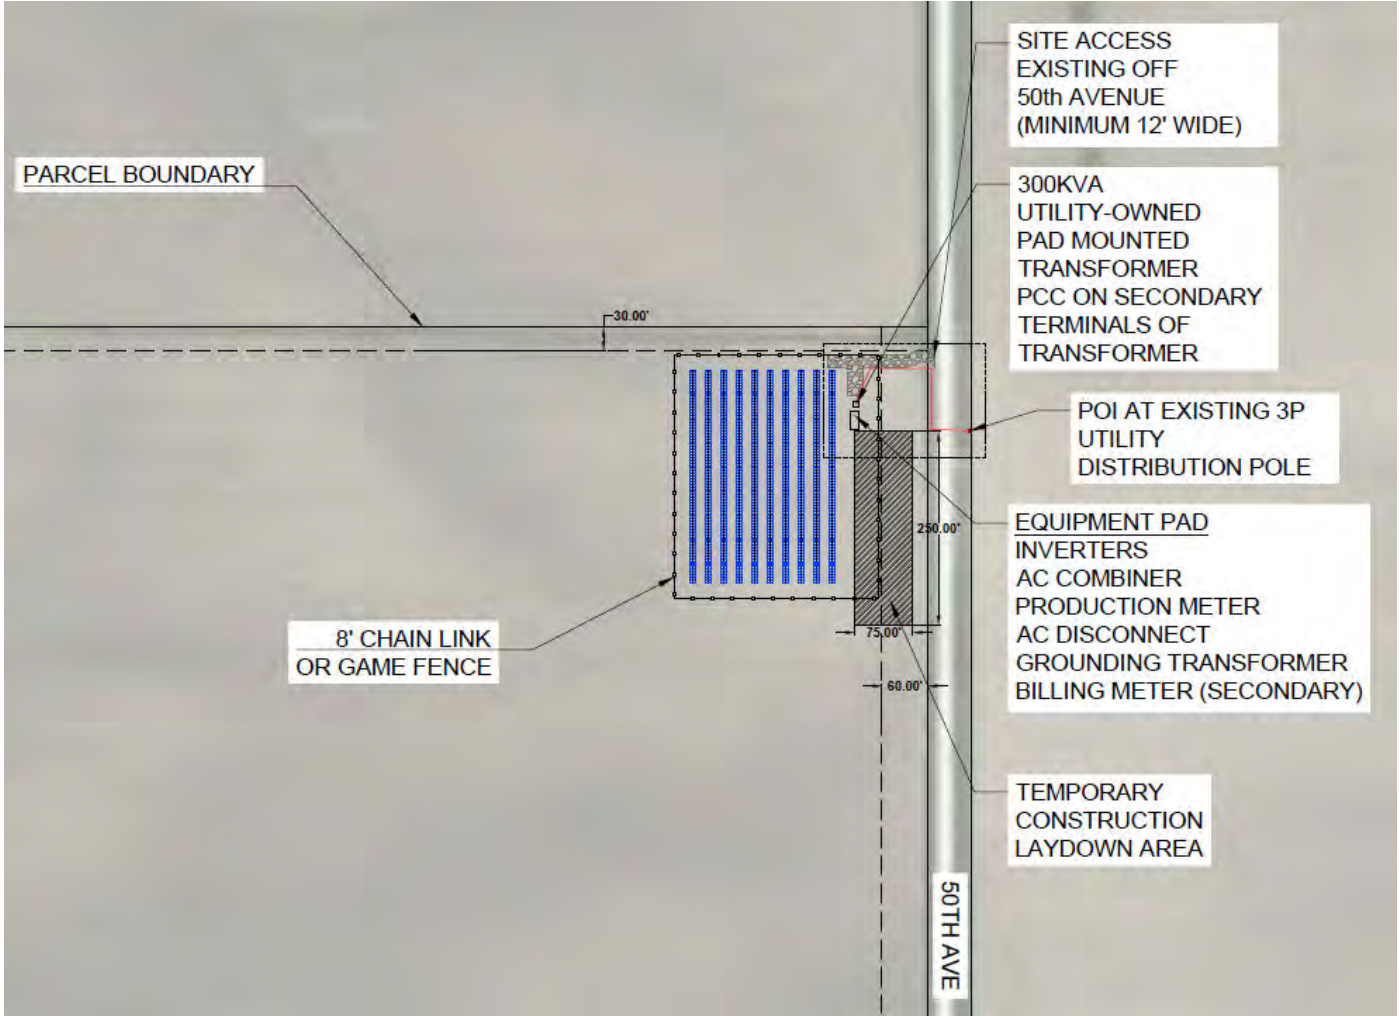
Pivot Energy Minnesota Solar 18 LLC Site Plan
